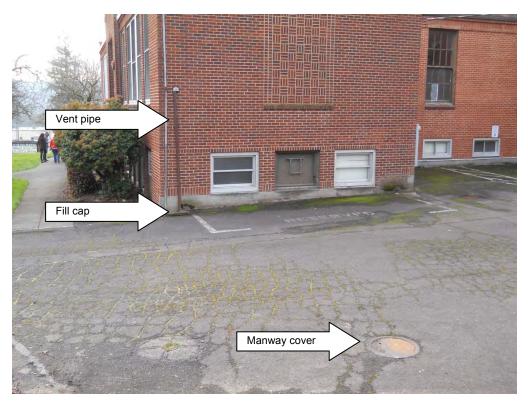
Vent pipe, fill cap and manway cover located at the southeast corner of the school
